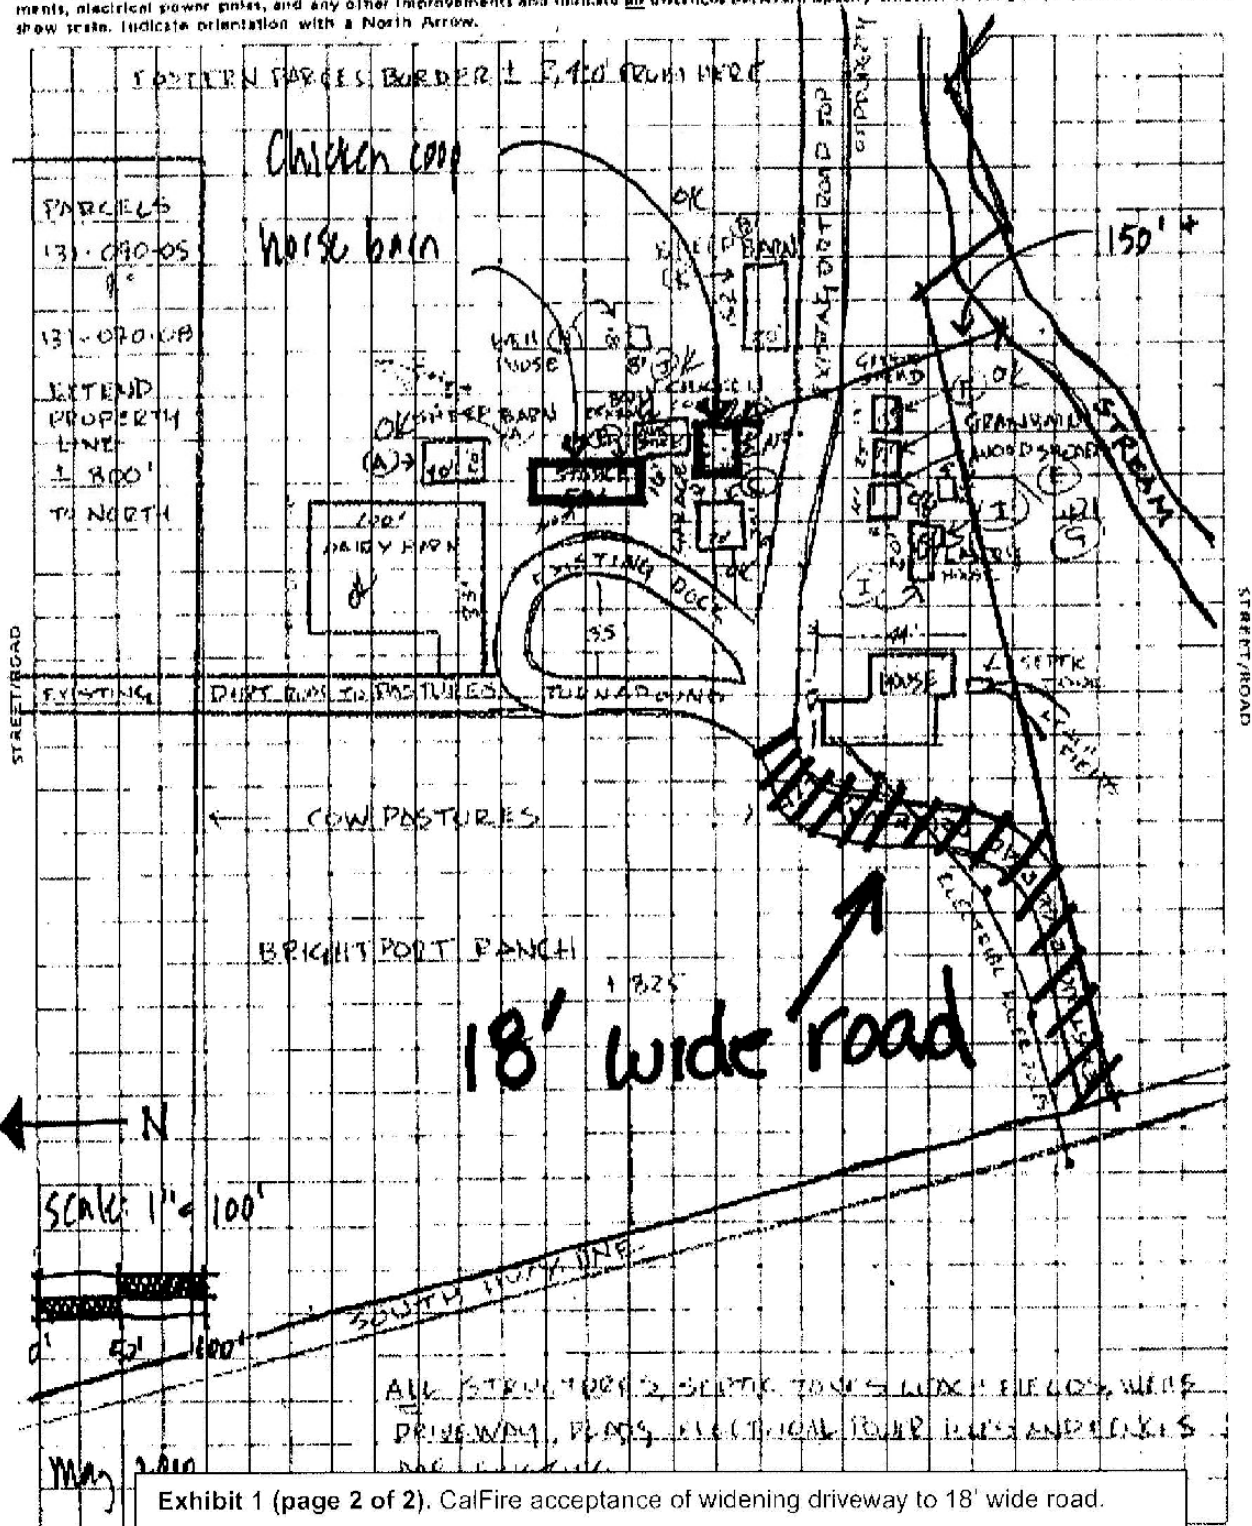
(page 2 of 2). CalFire acceptance of widening driveway to 18' wide road.
